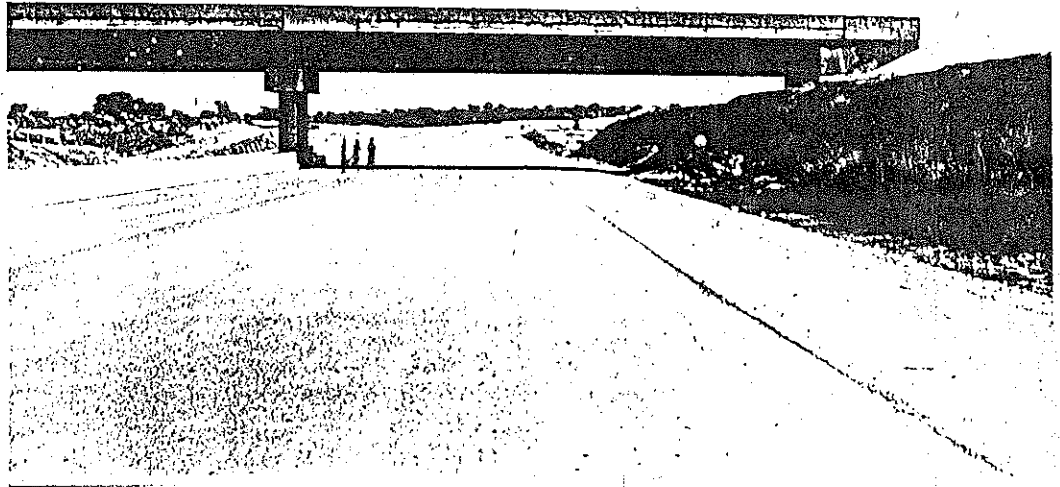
FLYOVER BRIDGE WITHOUT APPROACH ROAD
